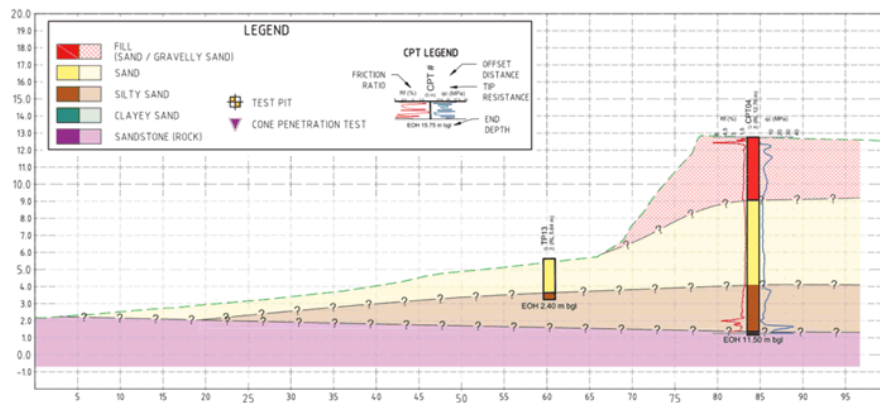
Cable Beach - Typical Geotechnical Profile of Beach and Dune
